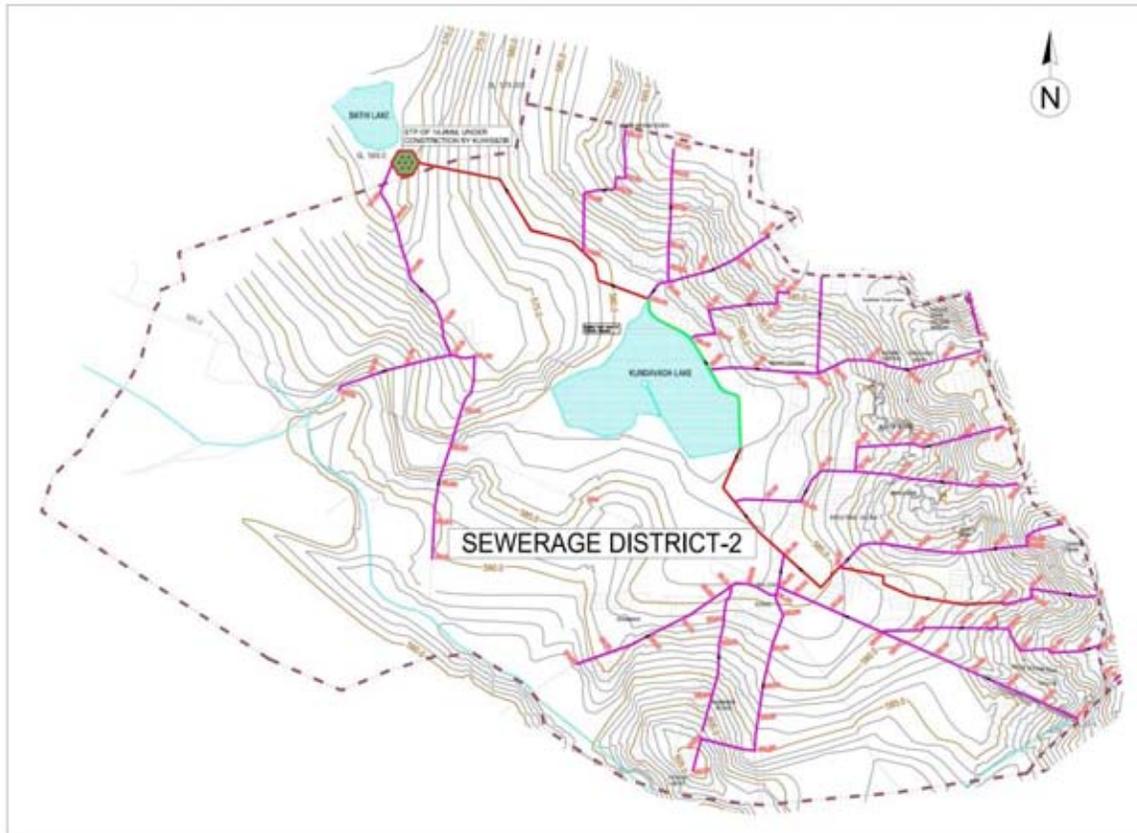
Sewerage Concept Plan for District 2 with Trunk Sewer of UIDSSMT, Main and Branch Sewers Proposed under KIUWRMIP
